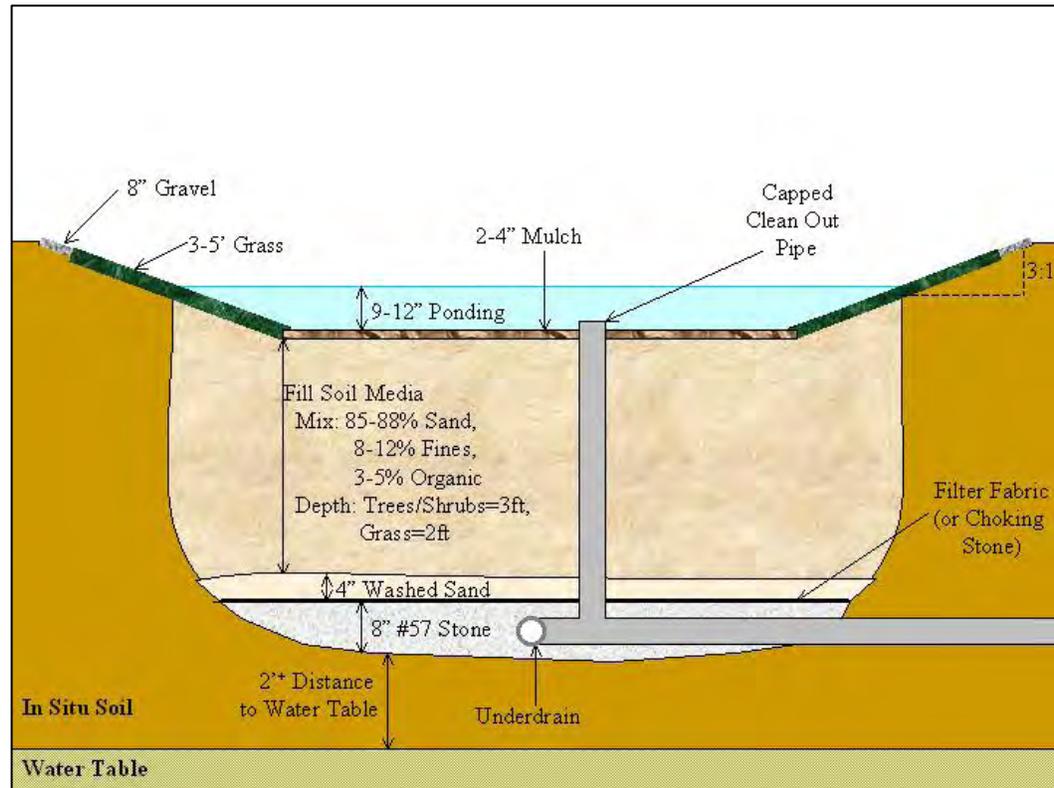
Bioretention Conceptual Layout: Cross-Section (Source: NCDENR)
